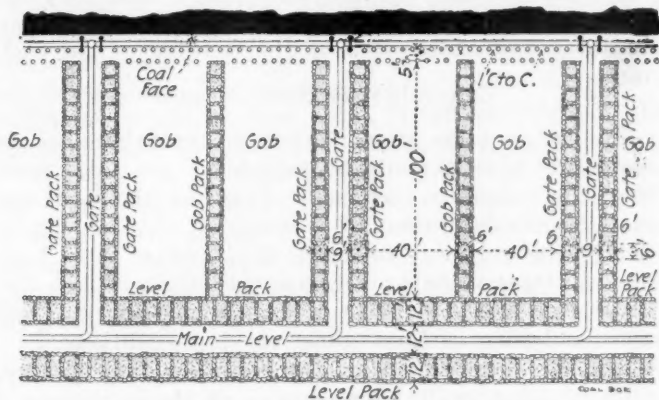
SHOWING GATEROADS LEADING TO LONGWALL FACE
